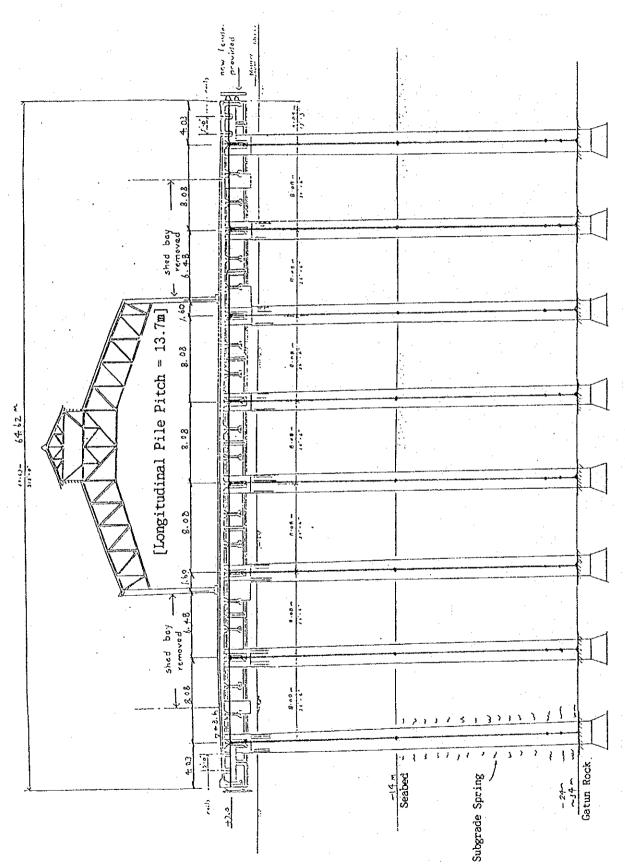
Typical Section and Frame: Pier No. 7
